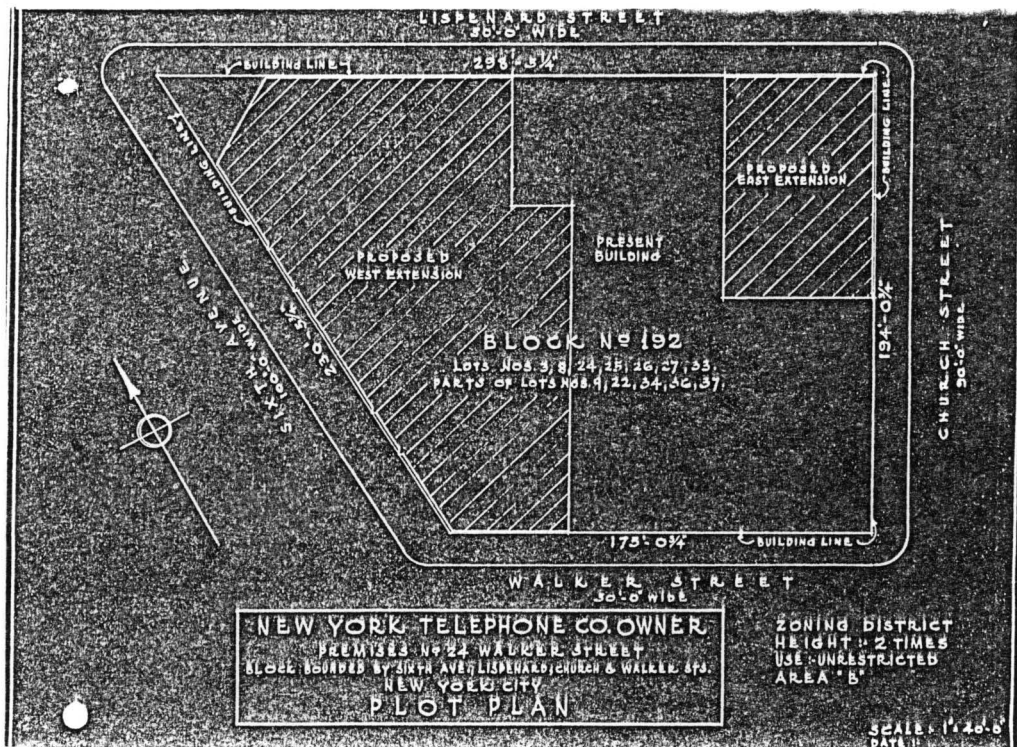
Plot Plan submitted in 1930 showing Walker Lispenard Building and proposed extensions. NYC, Department of Buildings, Manhattan. Plans, Permits and Dockets [Block 192]. Municipal Archives.
